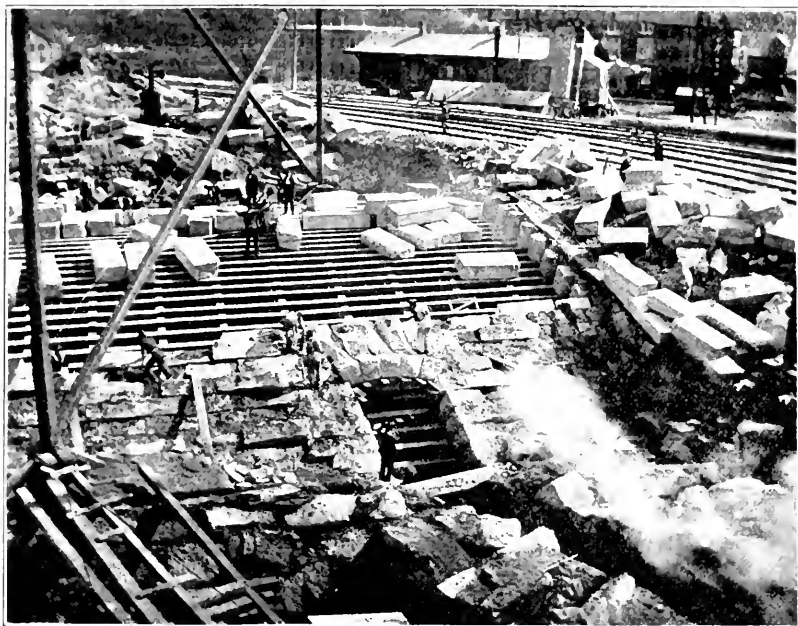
HYDE PARK AVENUE ARCH, UNDER CONSTRUCTION, READVILLE.
